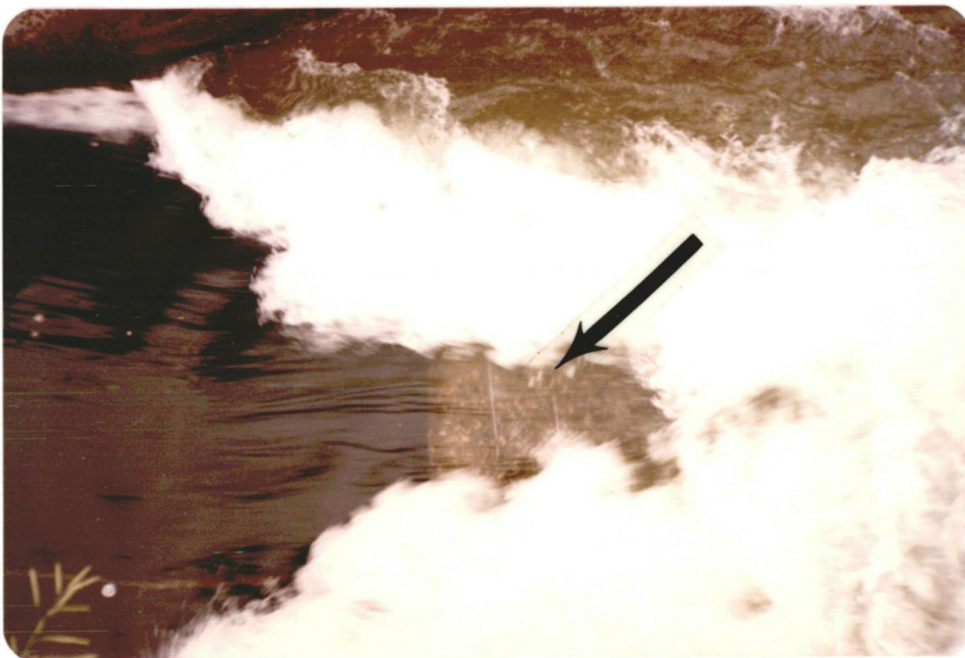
Azotea Tunnel outlet structure. Exposed rebar directly below neoprene belting (1984).
